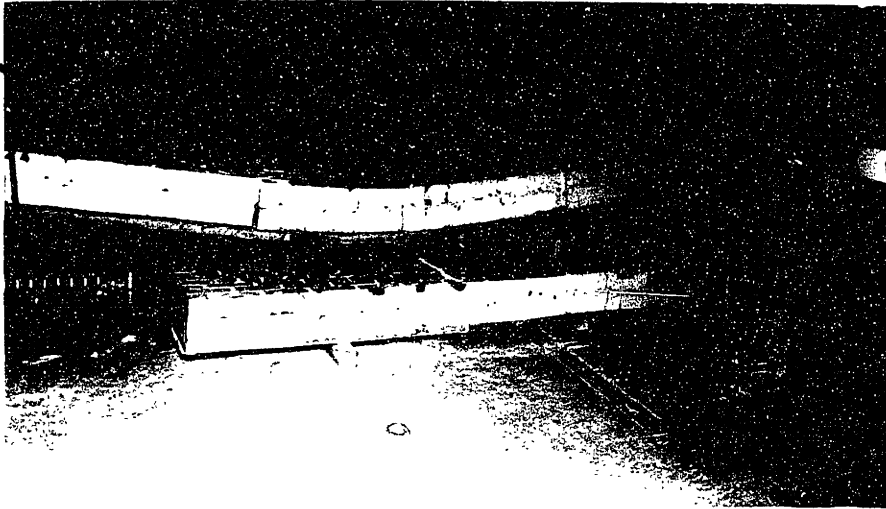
Bending Moment Failure of Reinforced Gunited Masonry Beam
